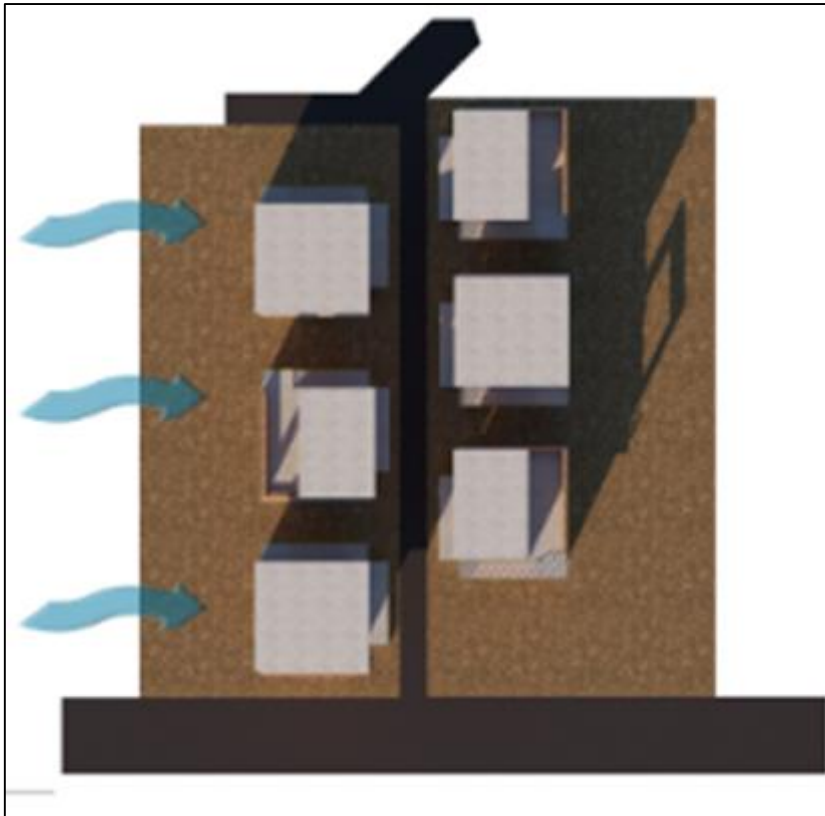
CLUSTER PLAN - ARRANGEMENT AVOIDING TUNNEL EFFECT
